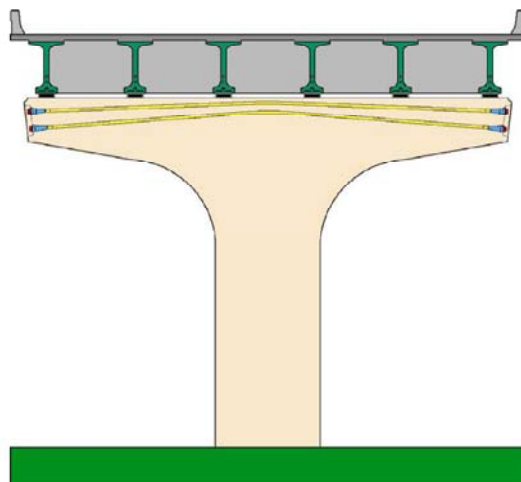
Post-Tensioning in Hammerhead Piers.
